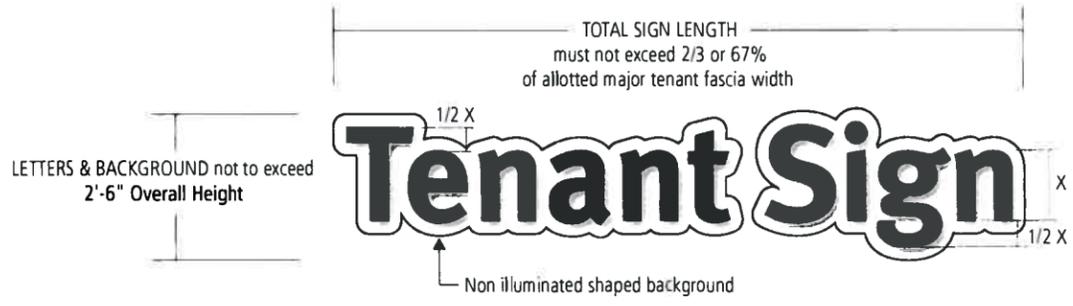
Exhibit C | Typical Retail Tenant Building Sign- Letters with Shaped Background Panel
